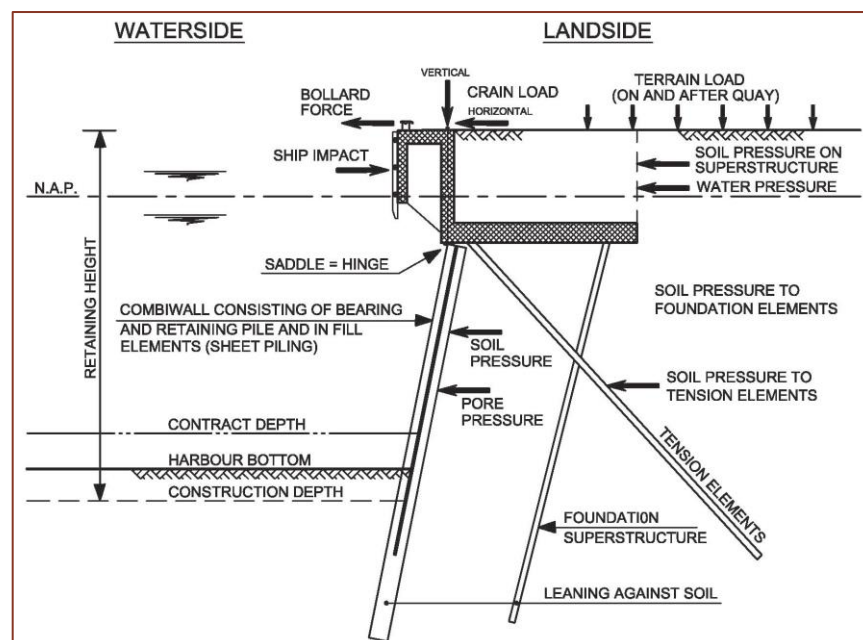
Principle design features and imposed loads on a quay wall [Gijt, 2010]
